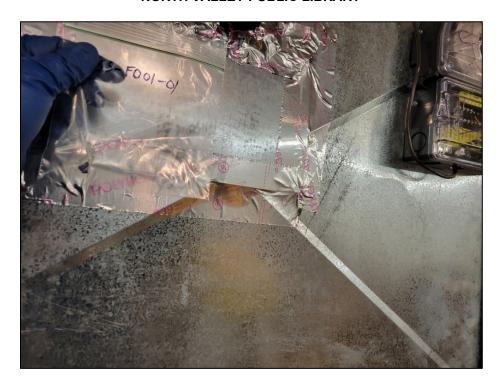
FO01: Pink lettering foil on heating/cooling unit near Montana room
